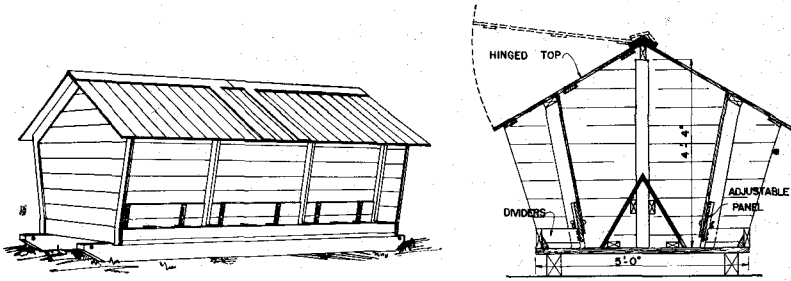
A substantially built feeder for a large number of hogs, with a hopper large enough to hold a grain supply for several days.
